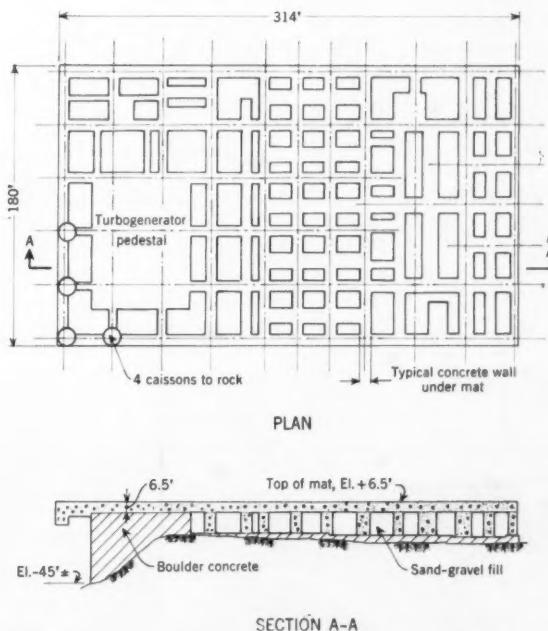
Yokosuka Thermal Power Plant was built chiefly on rock fill. The main building area, however, was first filled partially with boulder concrete and then the remaining space, up to the building mat, was filled with a network of supporting walls of concrete.
